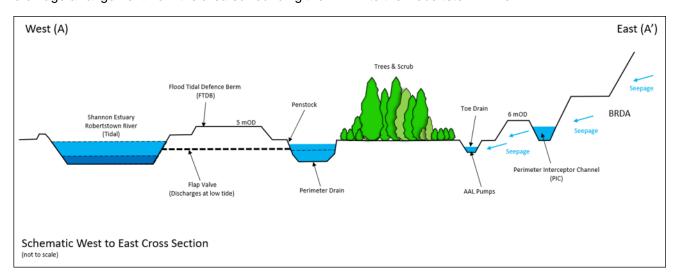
Schematic Cross-Section A-A' showing surface water drainage to Robertstown River
